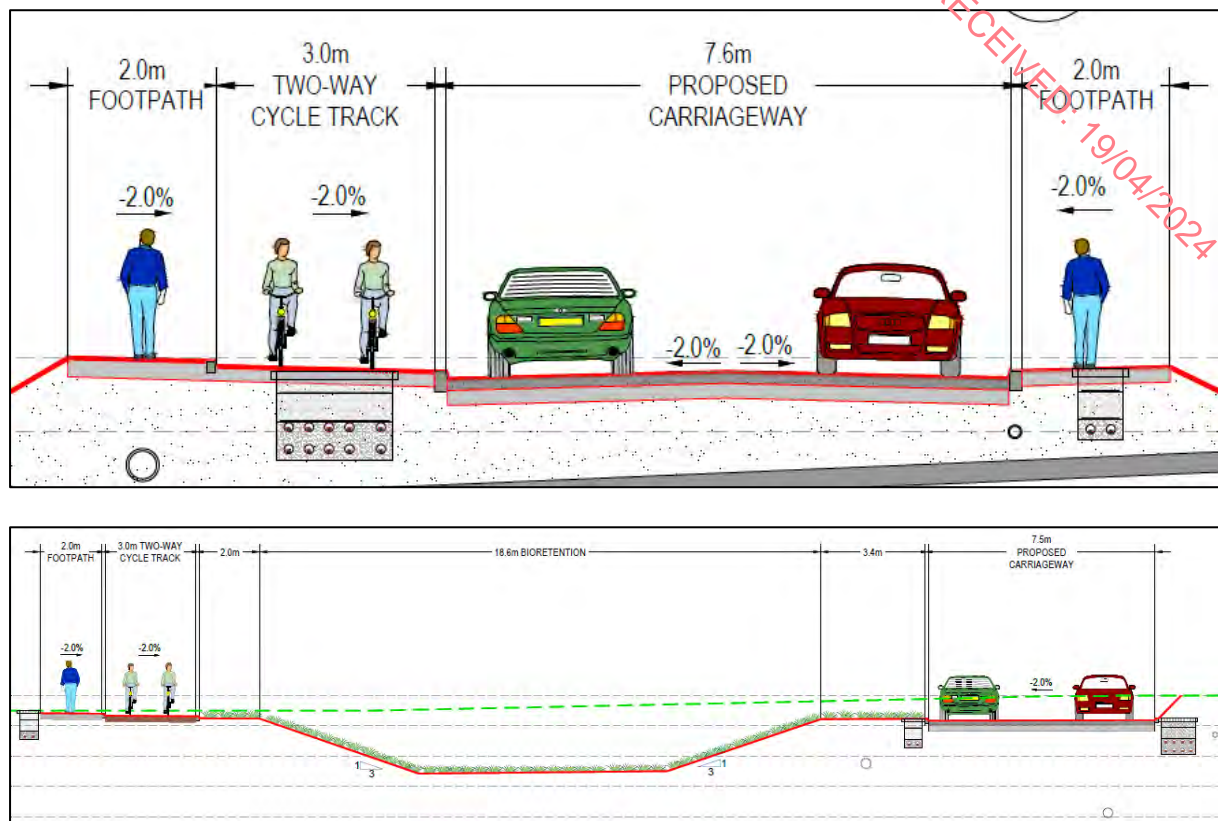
Zone F – Cross Sections of Proposed Access Road.
